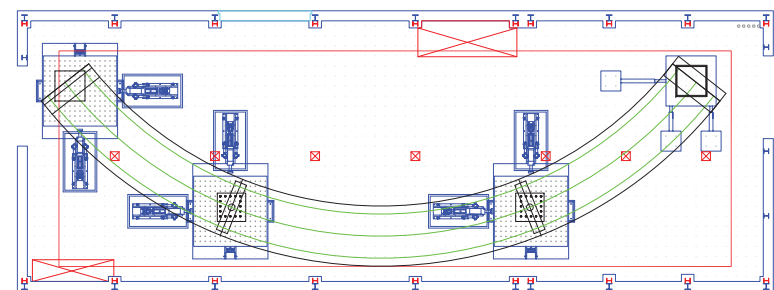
Plan View of the Curved Bridge Spanning Four Shake Tables in the Large-Scale Structures Laboratory
